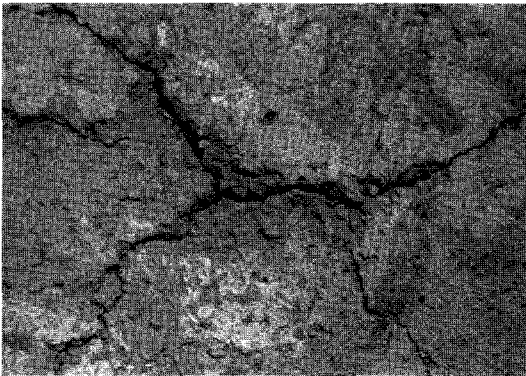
Detail of damaged 18th Cent. temple mud wall painting, Kimhae Eunha-sa.
